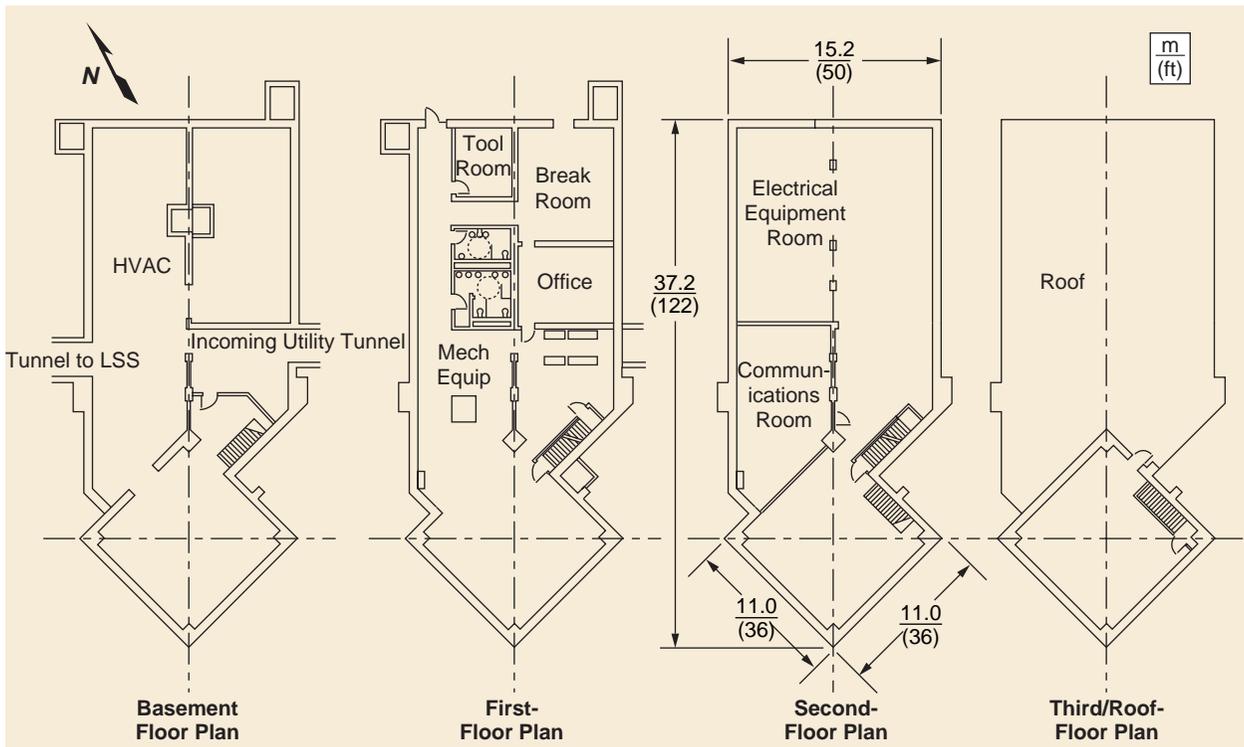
Space Launch Complex 37 Support Equipment Building (SEB)
